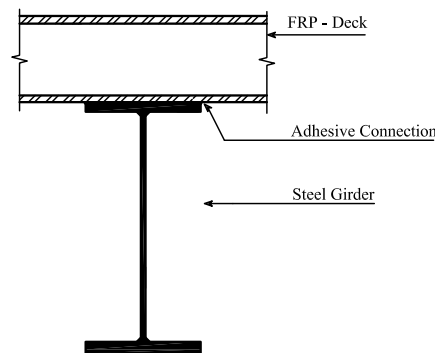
Adhesively-bonded connection between steel main girder and FRP bridge deck
